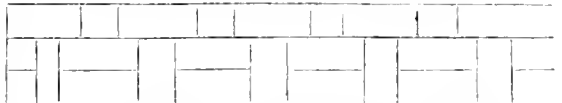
11-inch Wall, Flemish bond. 1st course.
